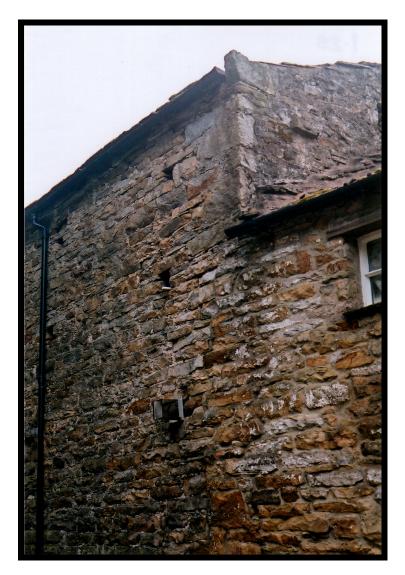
Northern elevation. The large quoin stones above the eaves level of the adjoining building.
